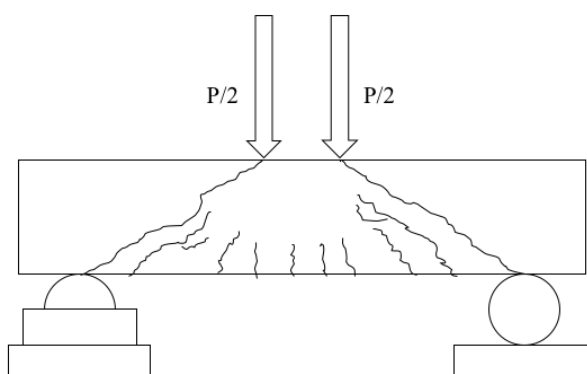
Shear failure of a reinforced concrete beam under applied load, redrawn based on [42].
